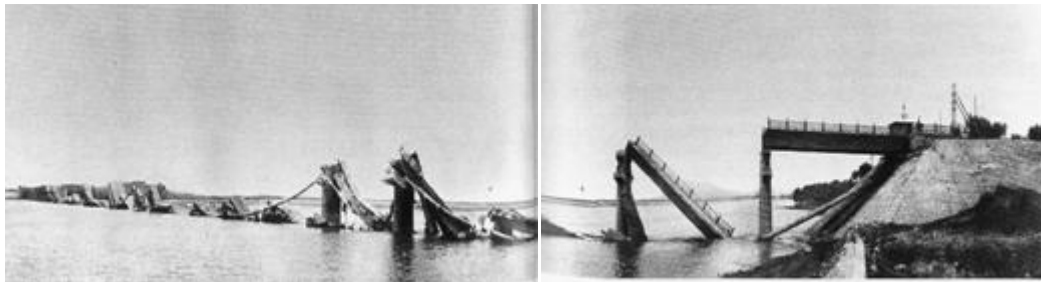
girder falling, Luanhe bridge, Tangshan earthquake
